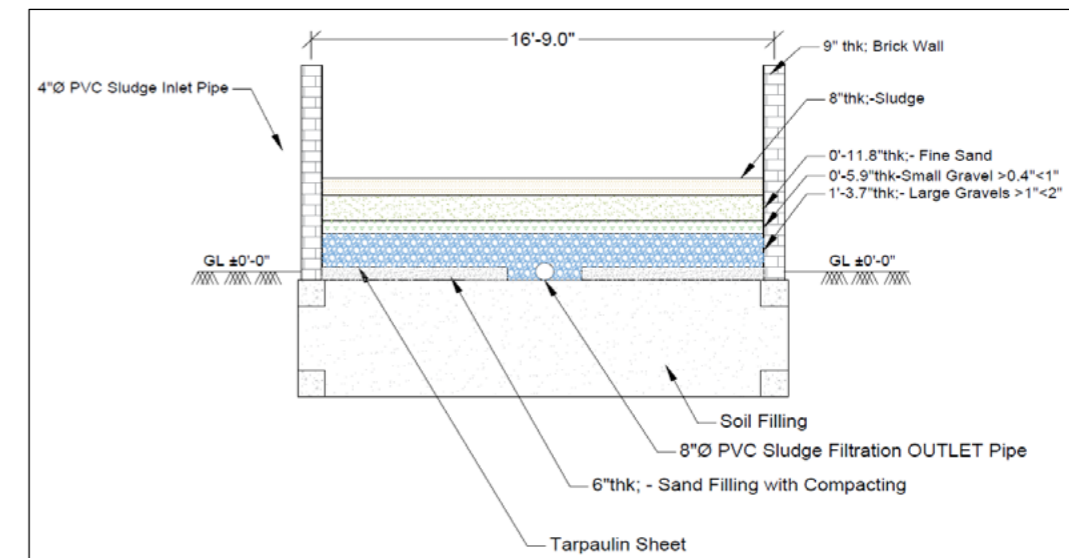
Drawing - Section view of a standard drying bed (Full of sludge)
